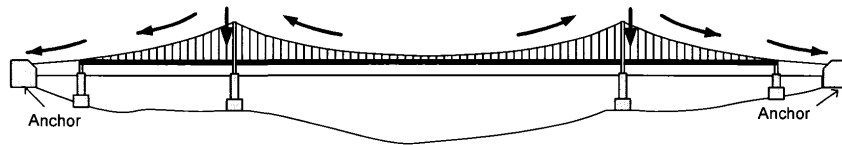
Cable force transfer mechanism for an externally-anchored suspension bridge
